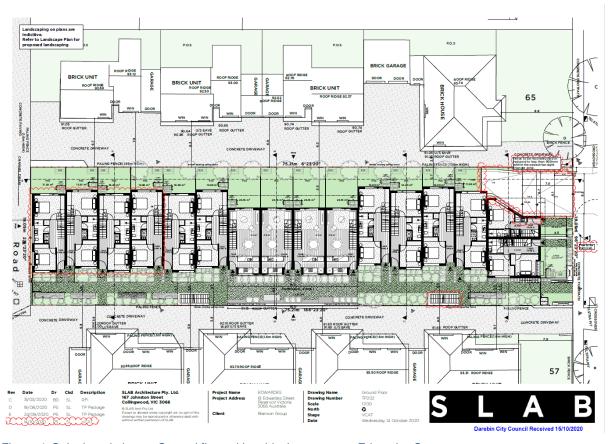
Substituted plans – Ground floor with vehicular access to Edwardes Street
